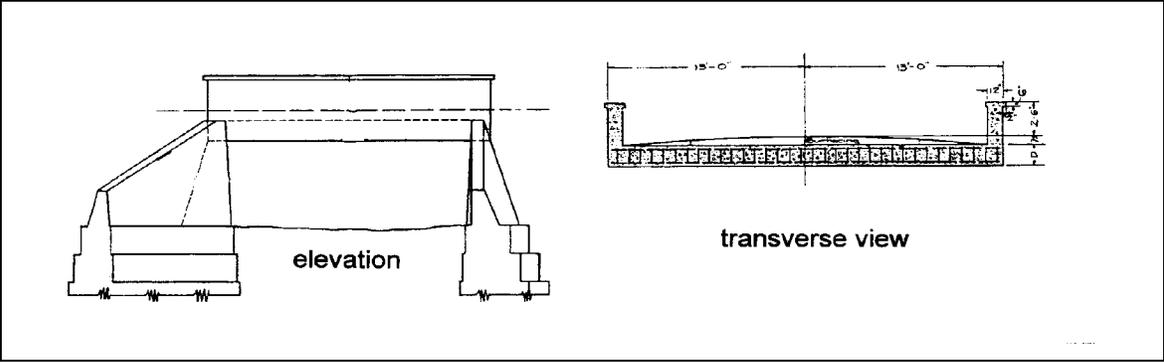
Elevation and transverse view of typical slab structure (Source: Maryland State Roads Commission, 1919 Standard Plans).
